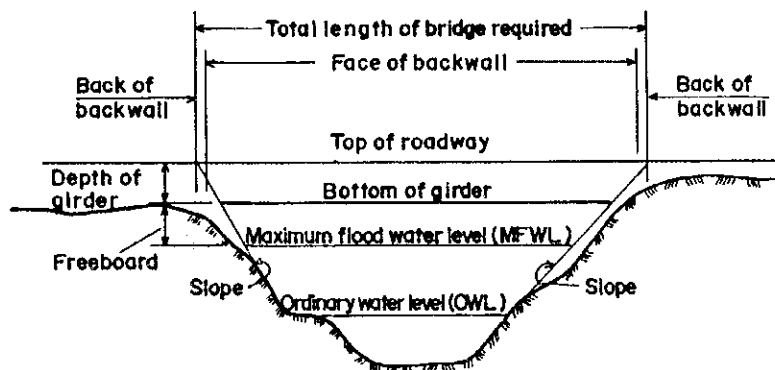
DETERMINATION OF BRIDGE LENGTH AND HEIGHT
